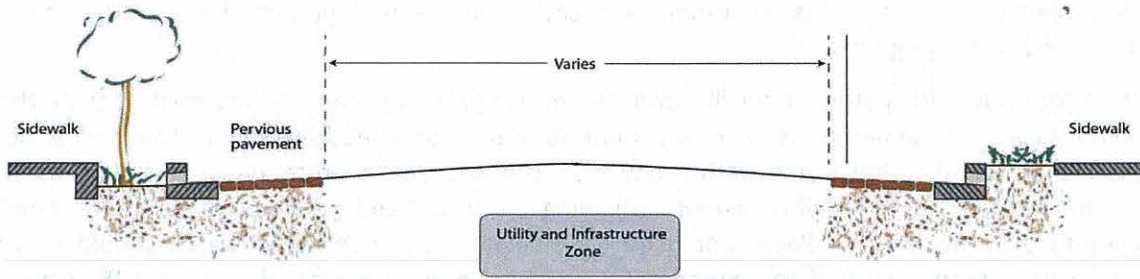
Possible pervious pavement design layout (*Model for Living Streets Design Manual, 2011*).
